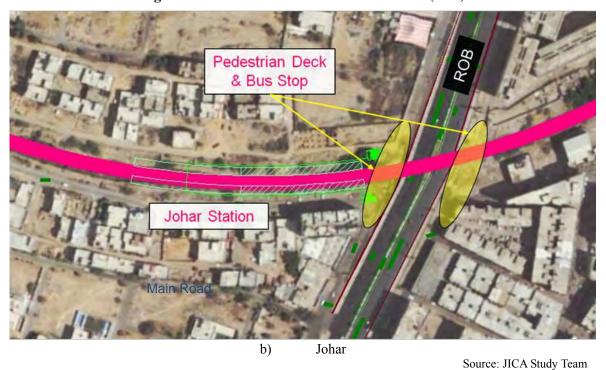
Provisional Station Plaza Plan (2/15)
